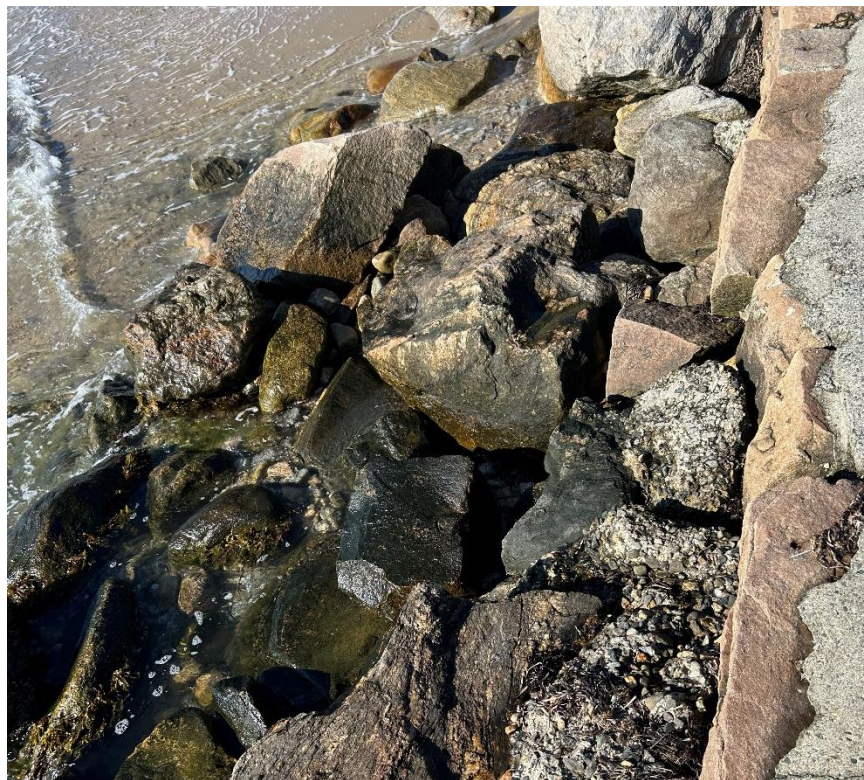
Osprey (South Beach) pier displaced armor stones South side
